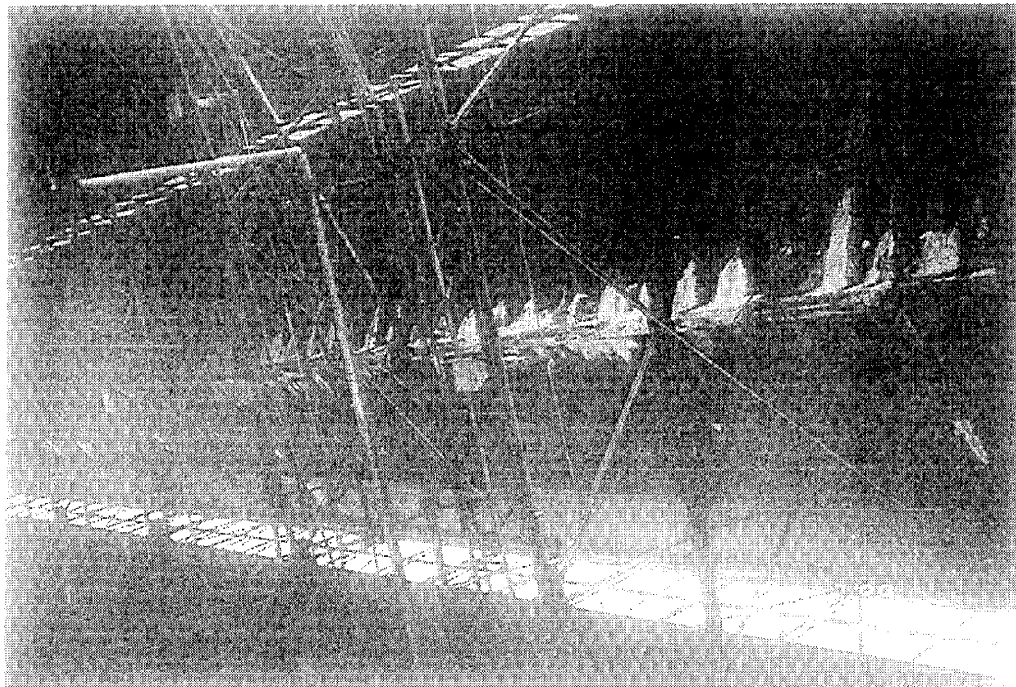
View of the ceiling of the building shell at the Hazorb Site, facing south.
